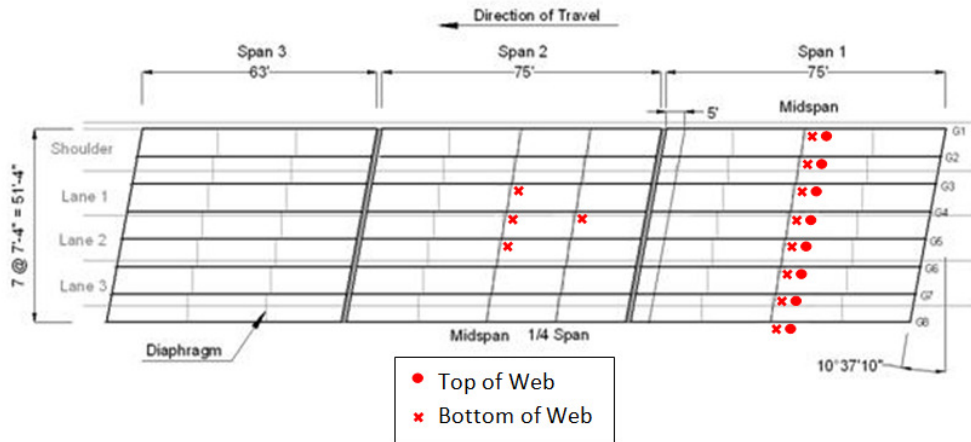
Strain Sensor Locations on the Composite Steel Girder Bridge.
